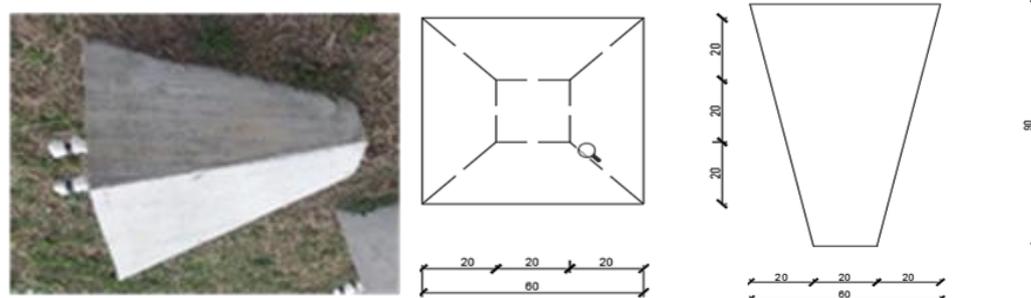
Precast wedge foundation – adapted from [29]: actual singular foundation before installation – left, singular foundation dimensions – middle and right.
